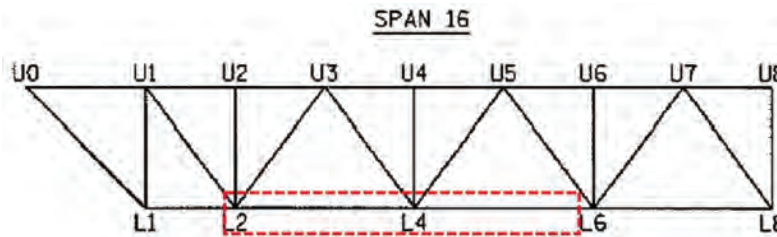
Winona Bridge deck truss span—specimens removed from area shown by the dashed line.
